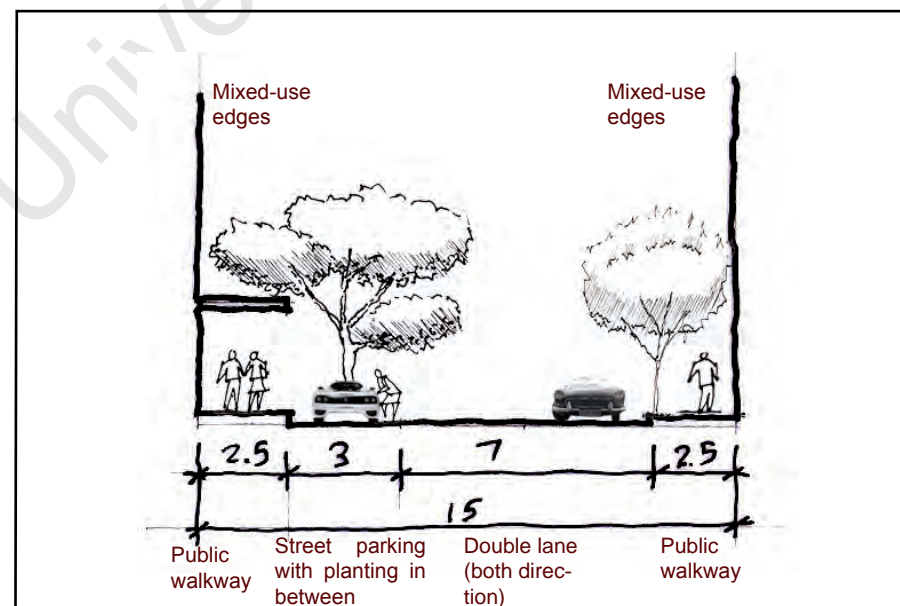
Generic section through a side street (Source: Author's sketch)
